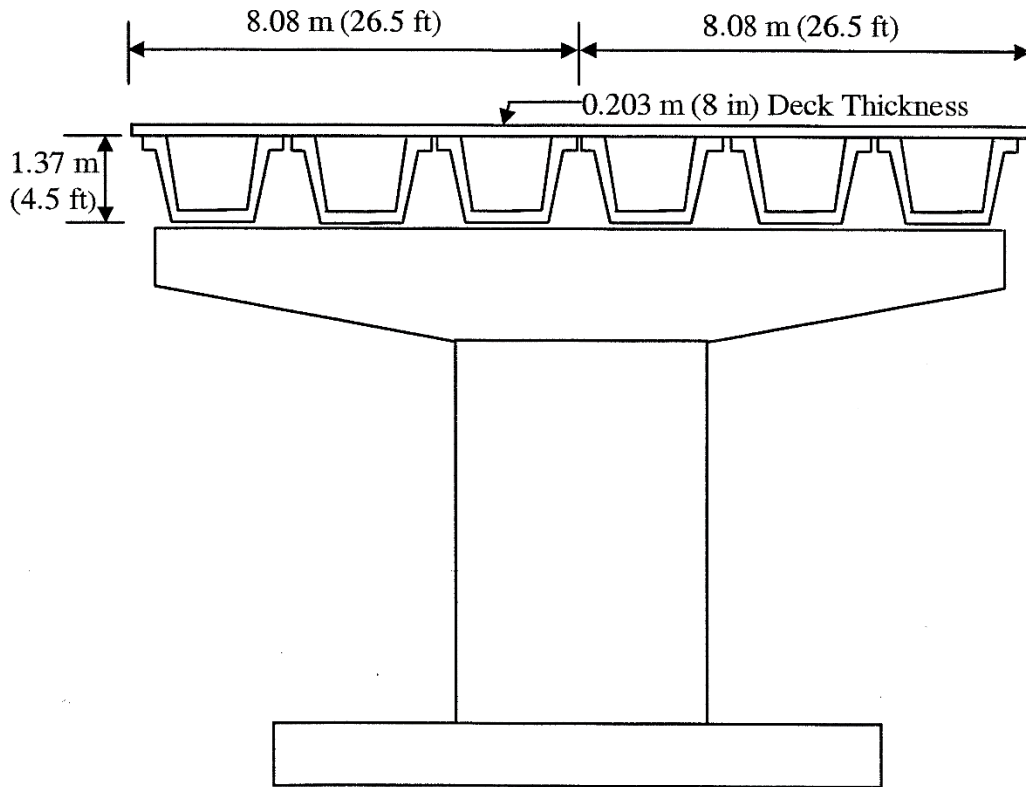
Bridge No. 9266 – typical cross-section (Liang 2004).
